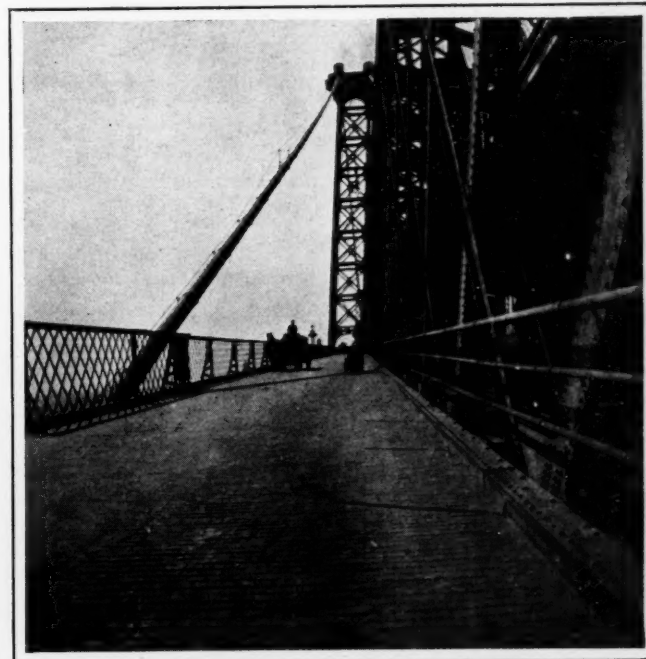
CREOSOLITE WOOD PAVEMENT; MAIN SPAN, WILLIAMSBURG BRIDGE, BROOKLYN, N. Y.
